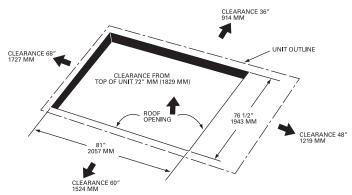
Heat Pump Models - 20 Tons * All dimensions are in inches/millimeters.
